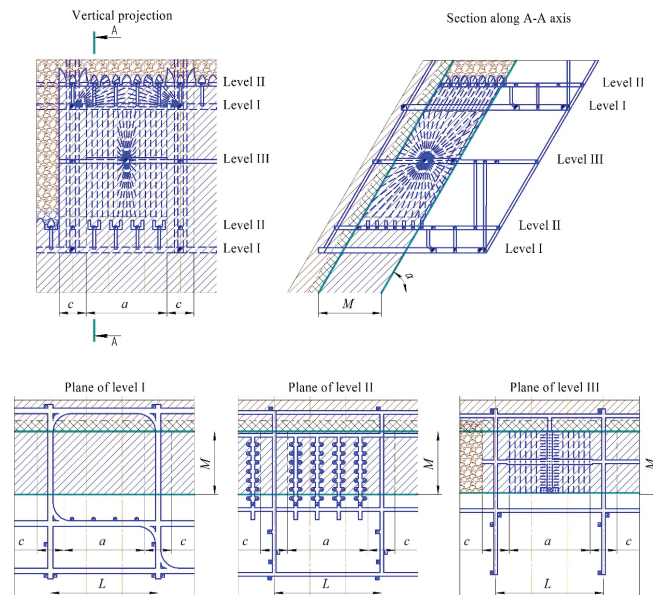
The proposed option of the room system with a protective layer and subsequent pillar caving
